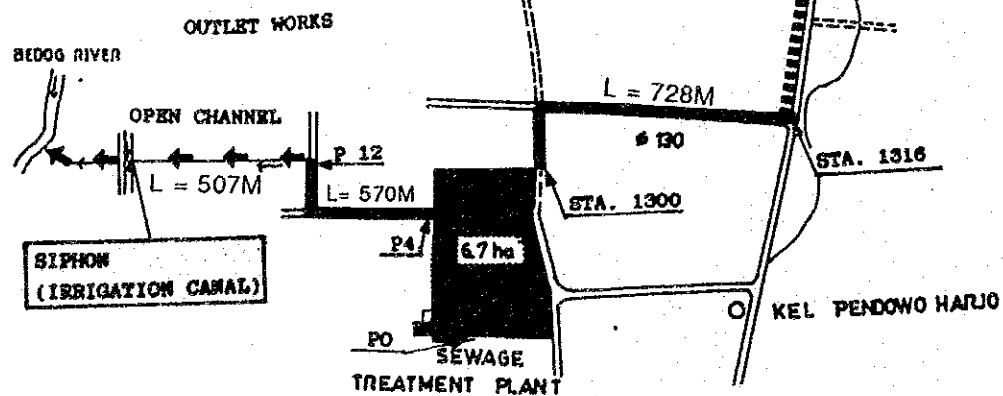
General Plan of Sewerage Facilities (JICA Scope)
